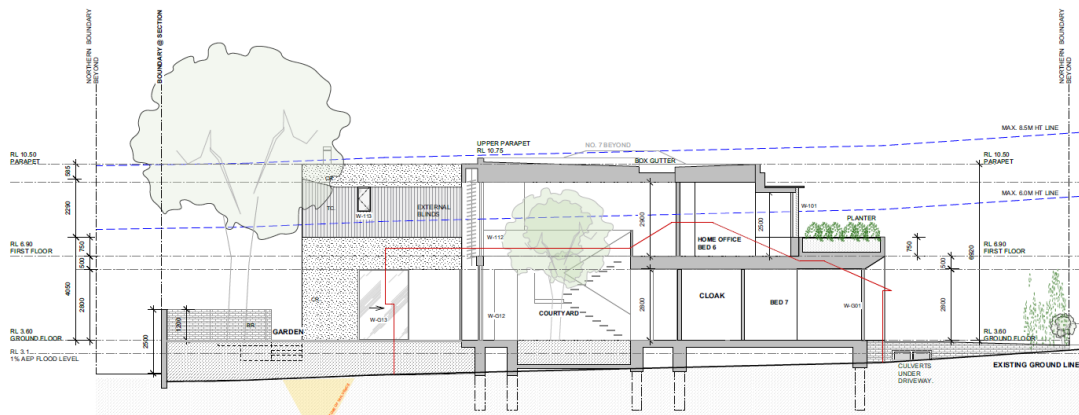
Proposed section A-A demonstrating 6 and 8.5m building line. Existing dwelling outlined red
